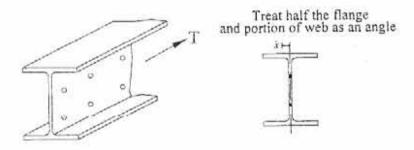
Determination of \overline{X} for I-Sections Connected at Web
